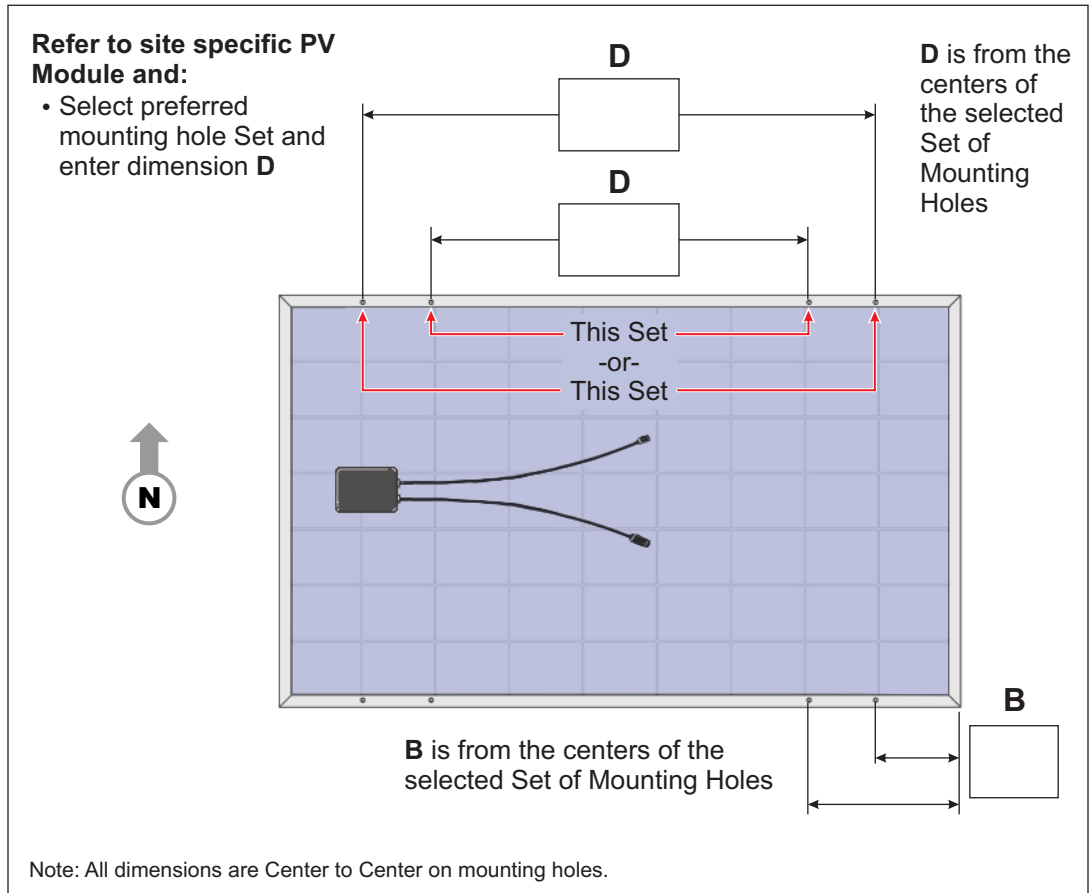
Select PV Module Mounting Hole Set, Record Dimensions B and D
